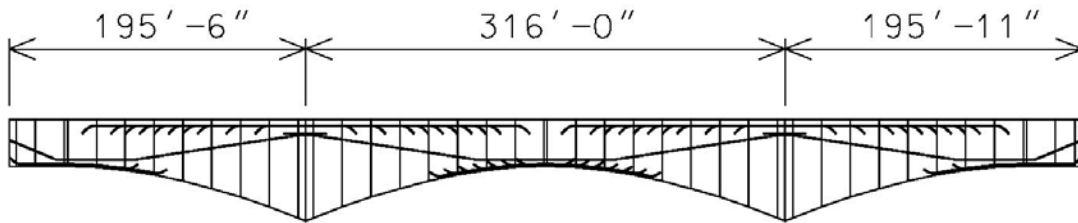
Span Layout for the Balanced-Cantilever Computer Models
